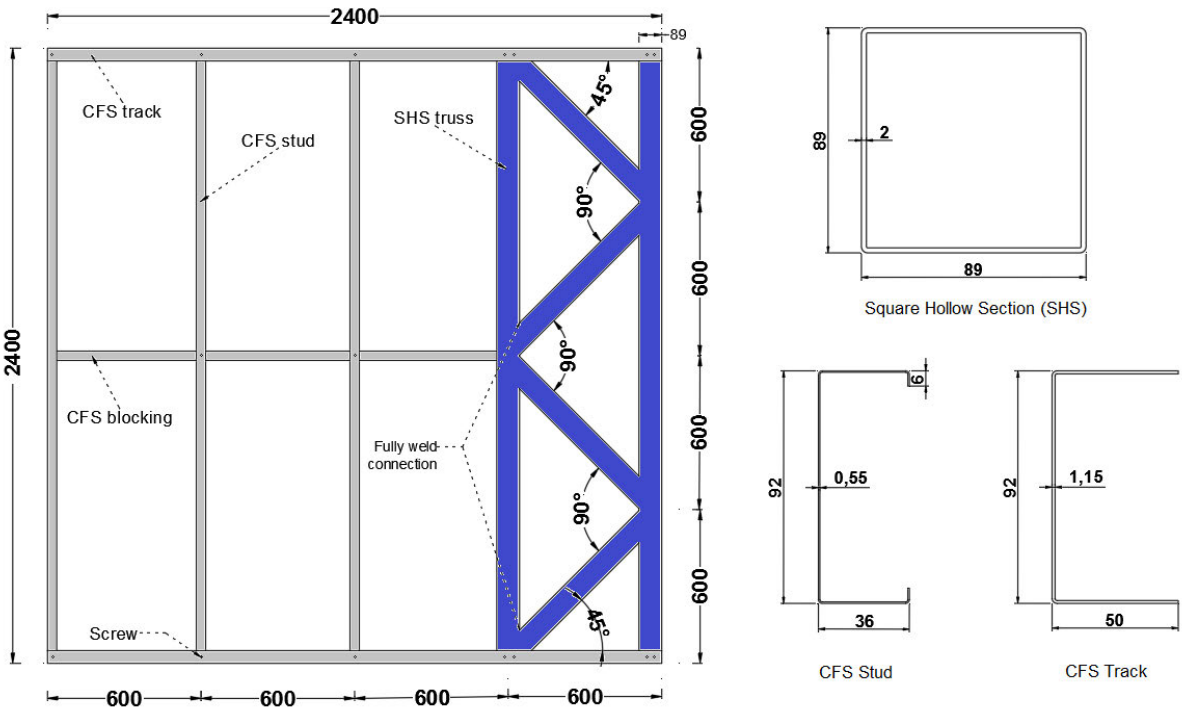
Detailed dimension of a typical hybrid wall in mm
